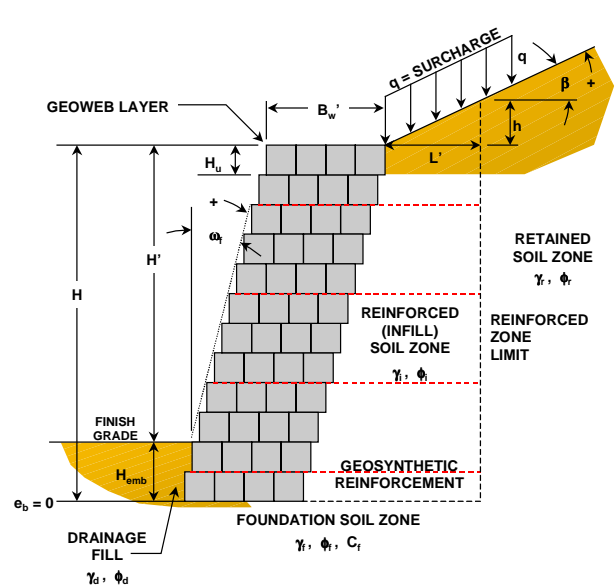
Design Model, Soil Reinforced Geoweb Wall
